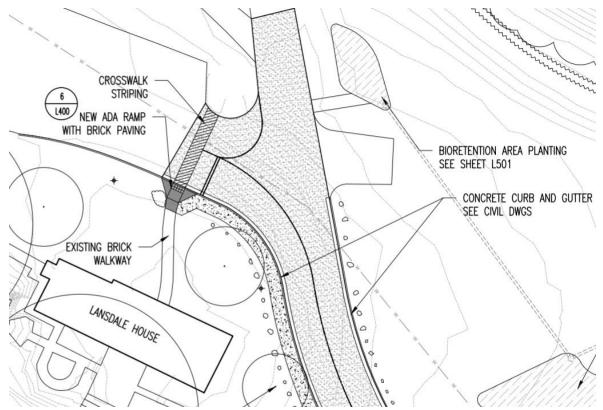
Detail of the proposed new ADA ramp in front of the C.W. Lansdale House.
